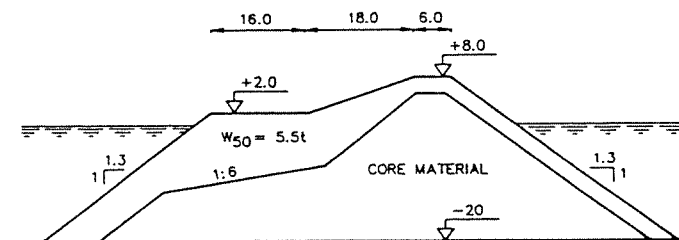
Typical cross-section for berm breakwater on Rennesøy. All measures are in metres.
